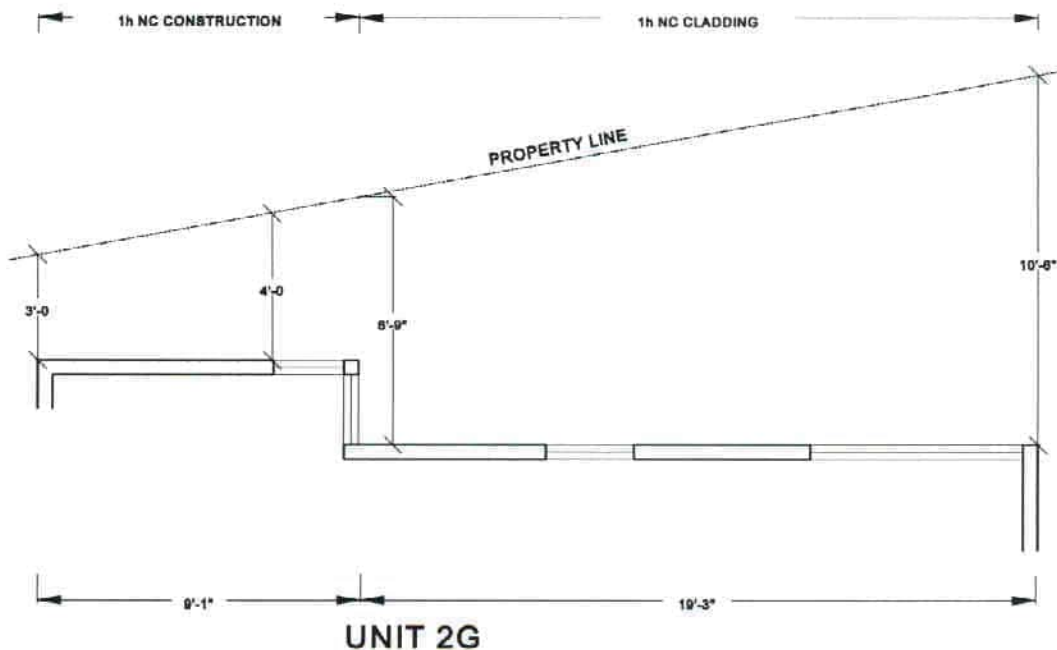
Figure A: Schematic Plan of North Exterior Wall, Unit 2G
